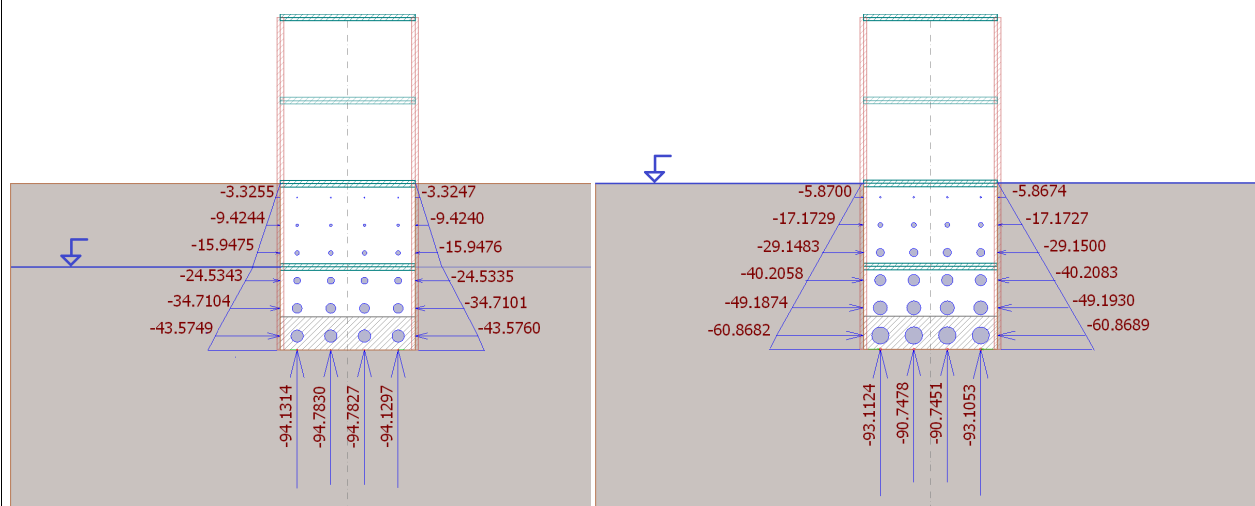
The total horizontal pressures (connection forces) on the walls in [kPa]
